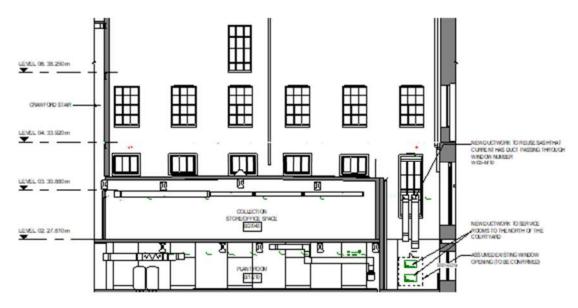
PROPOSED COURTYARD NORTH ELEVATION — PROPOSED DUCT ROUTES
